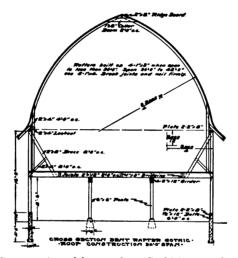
Cross-section of bent rafter (Gothic) type of construction.
